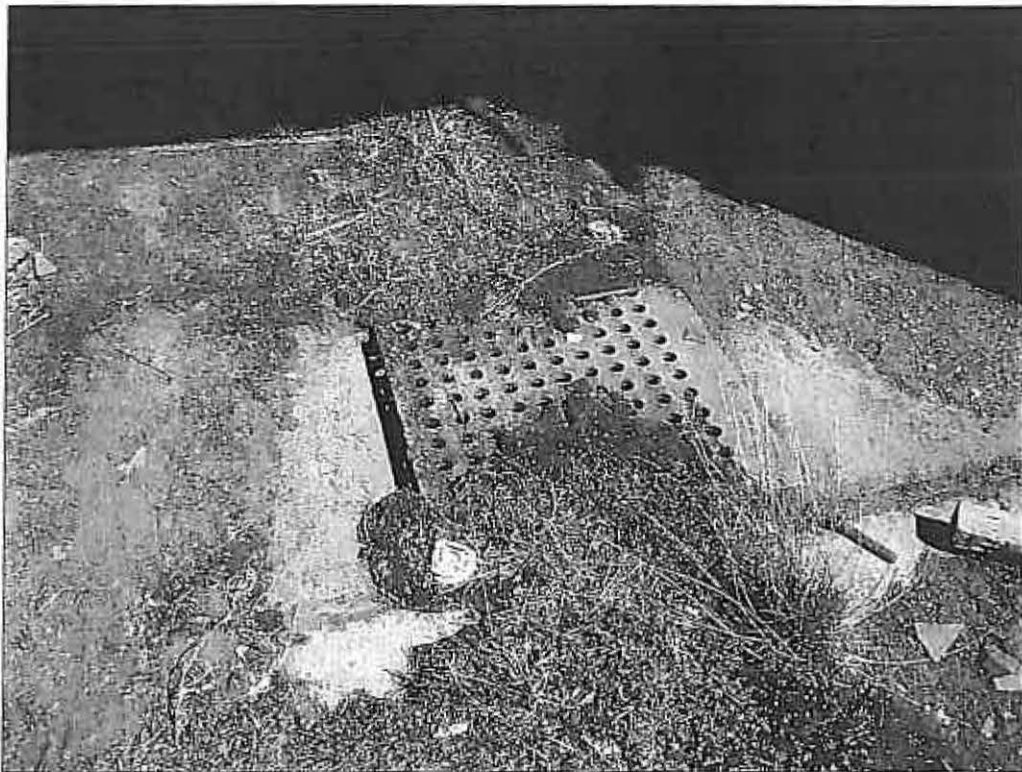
Catch basin (AOC C-1) on south side (near southwest corner) of Building No. 7.
